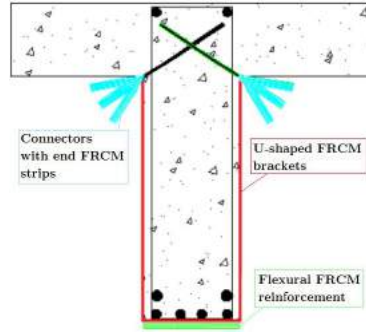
T-shaped beam of a road bridge reinforced with U-shaped brackets with connectors.
